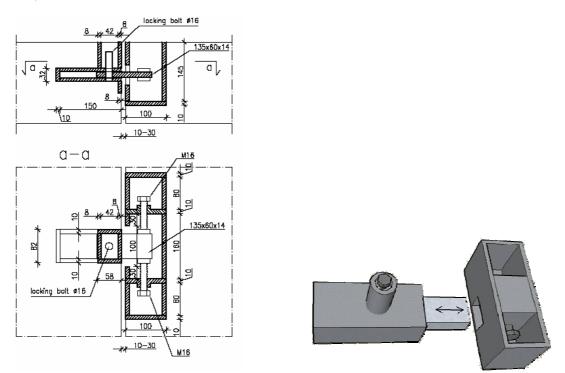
bolted wall to floor connection with one and two floor elements respectively, Consolis (2007).
